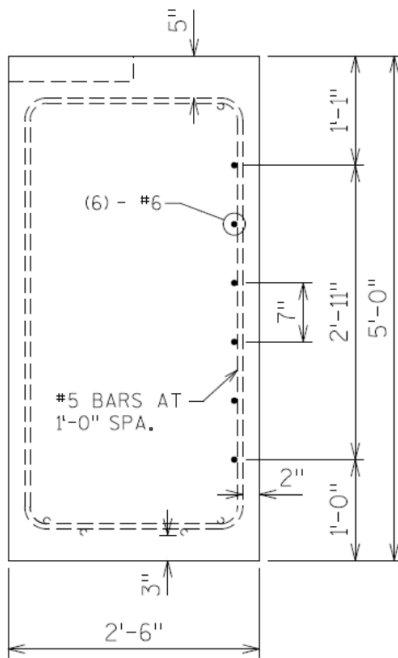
Abutment cross section in the original condition with (6)-#6 reinforcing bars on the tension side.
